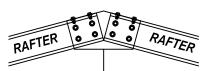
GABLE PURLIN CONNECTION - Z Section
